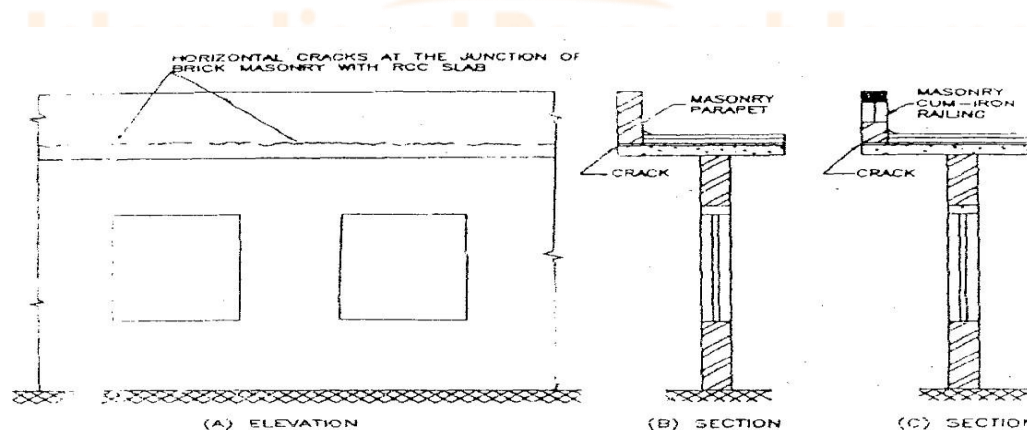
Horizontal crack at the base of brick masonry parapet (or masonry-cum-Iron Raing) supported on a projecting RCC slab.
